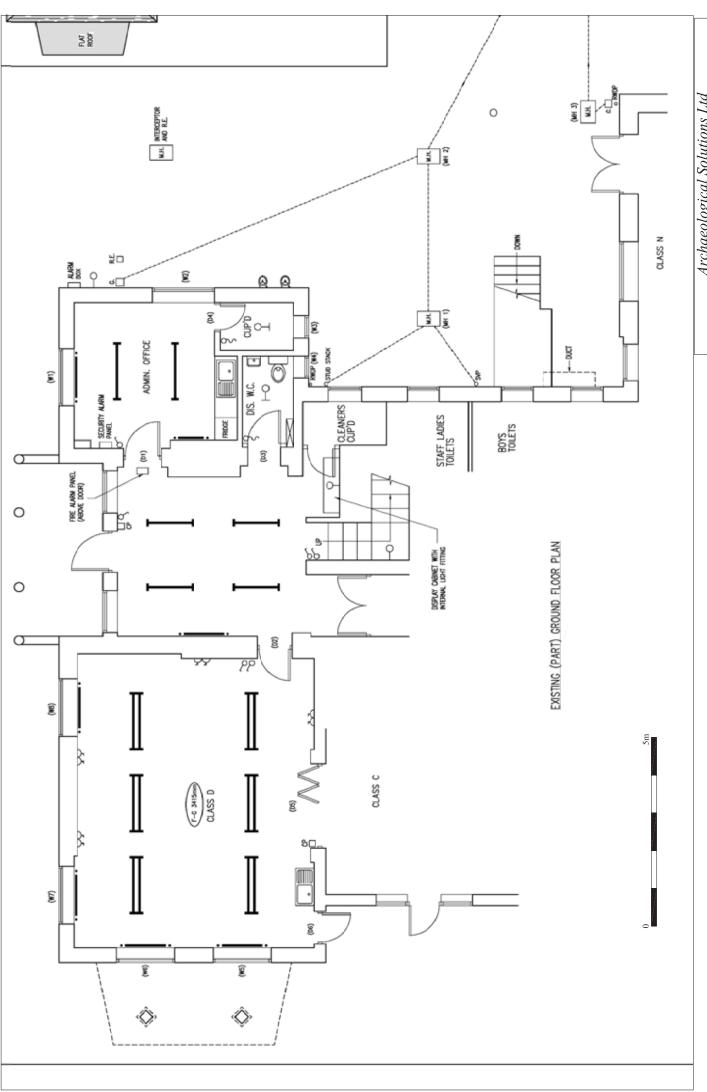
Area of monitoring Scale Plan 1:100, sections 1:20 at A4
